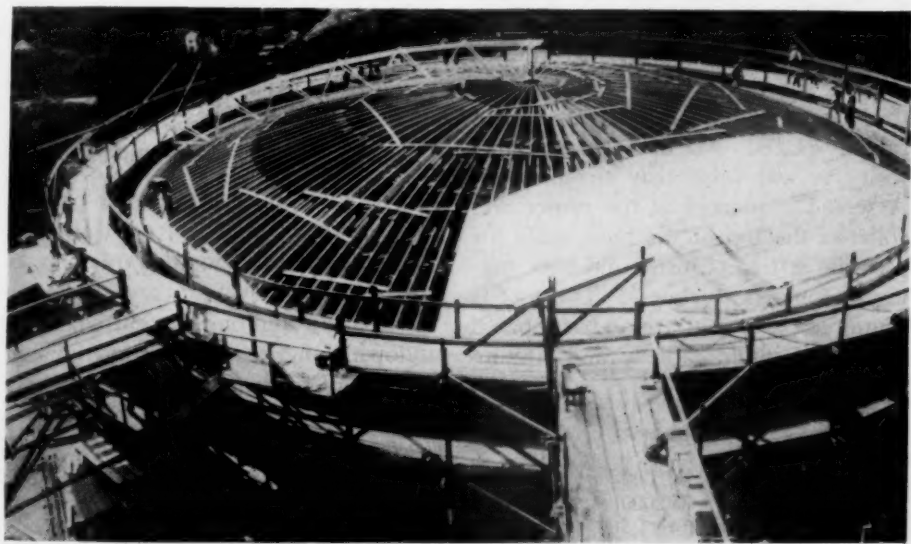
Roof Framing, Burdeck Reservoir—1.5 mil.gal.
